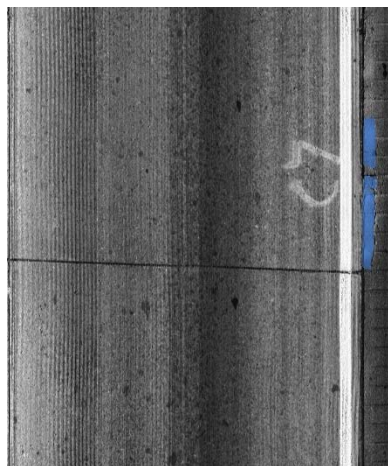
Shoulder-joint distress detection on Slab #C6'
